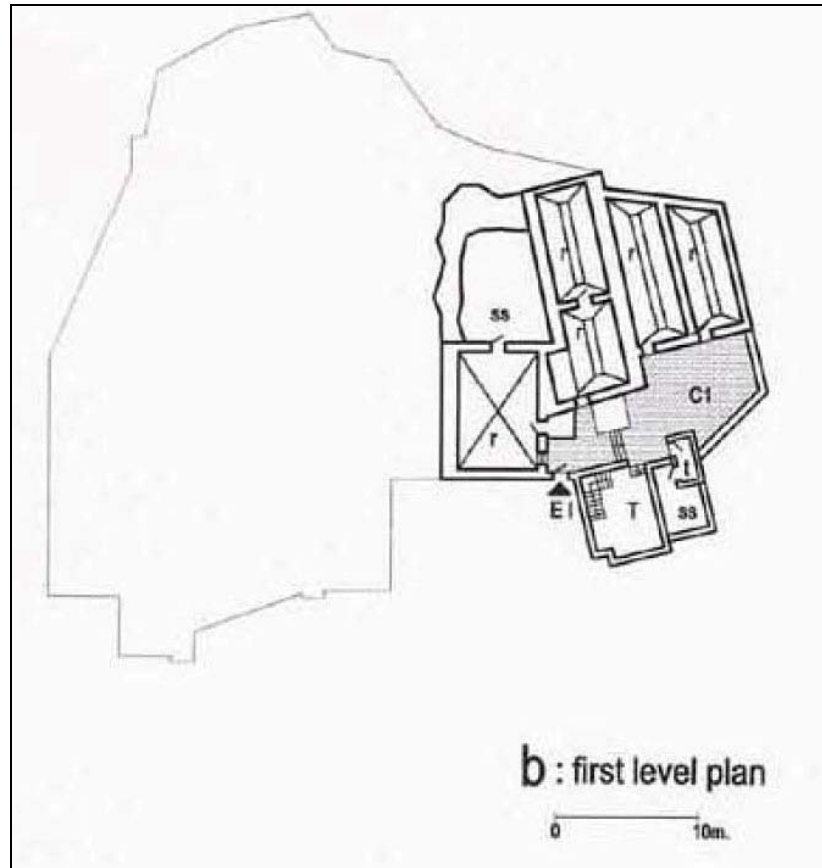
b: First Level Plan (Alioğlu (2003.132-133))
